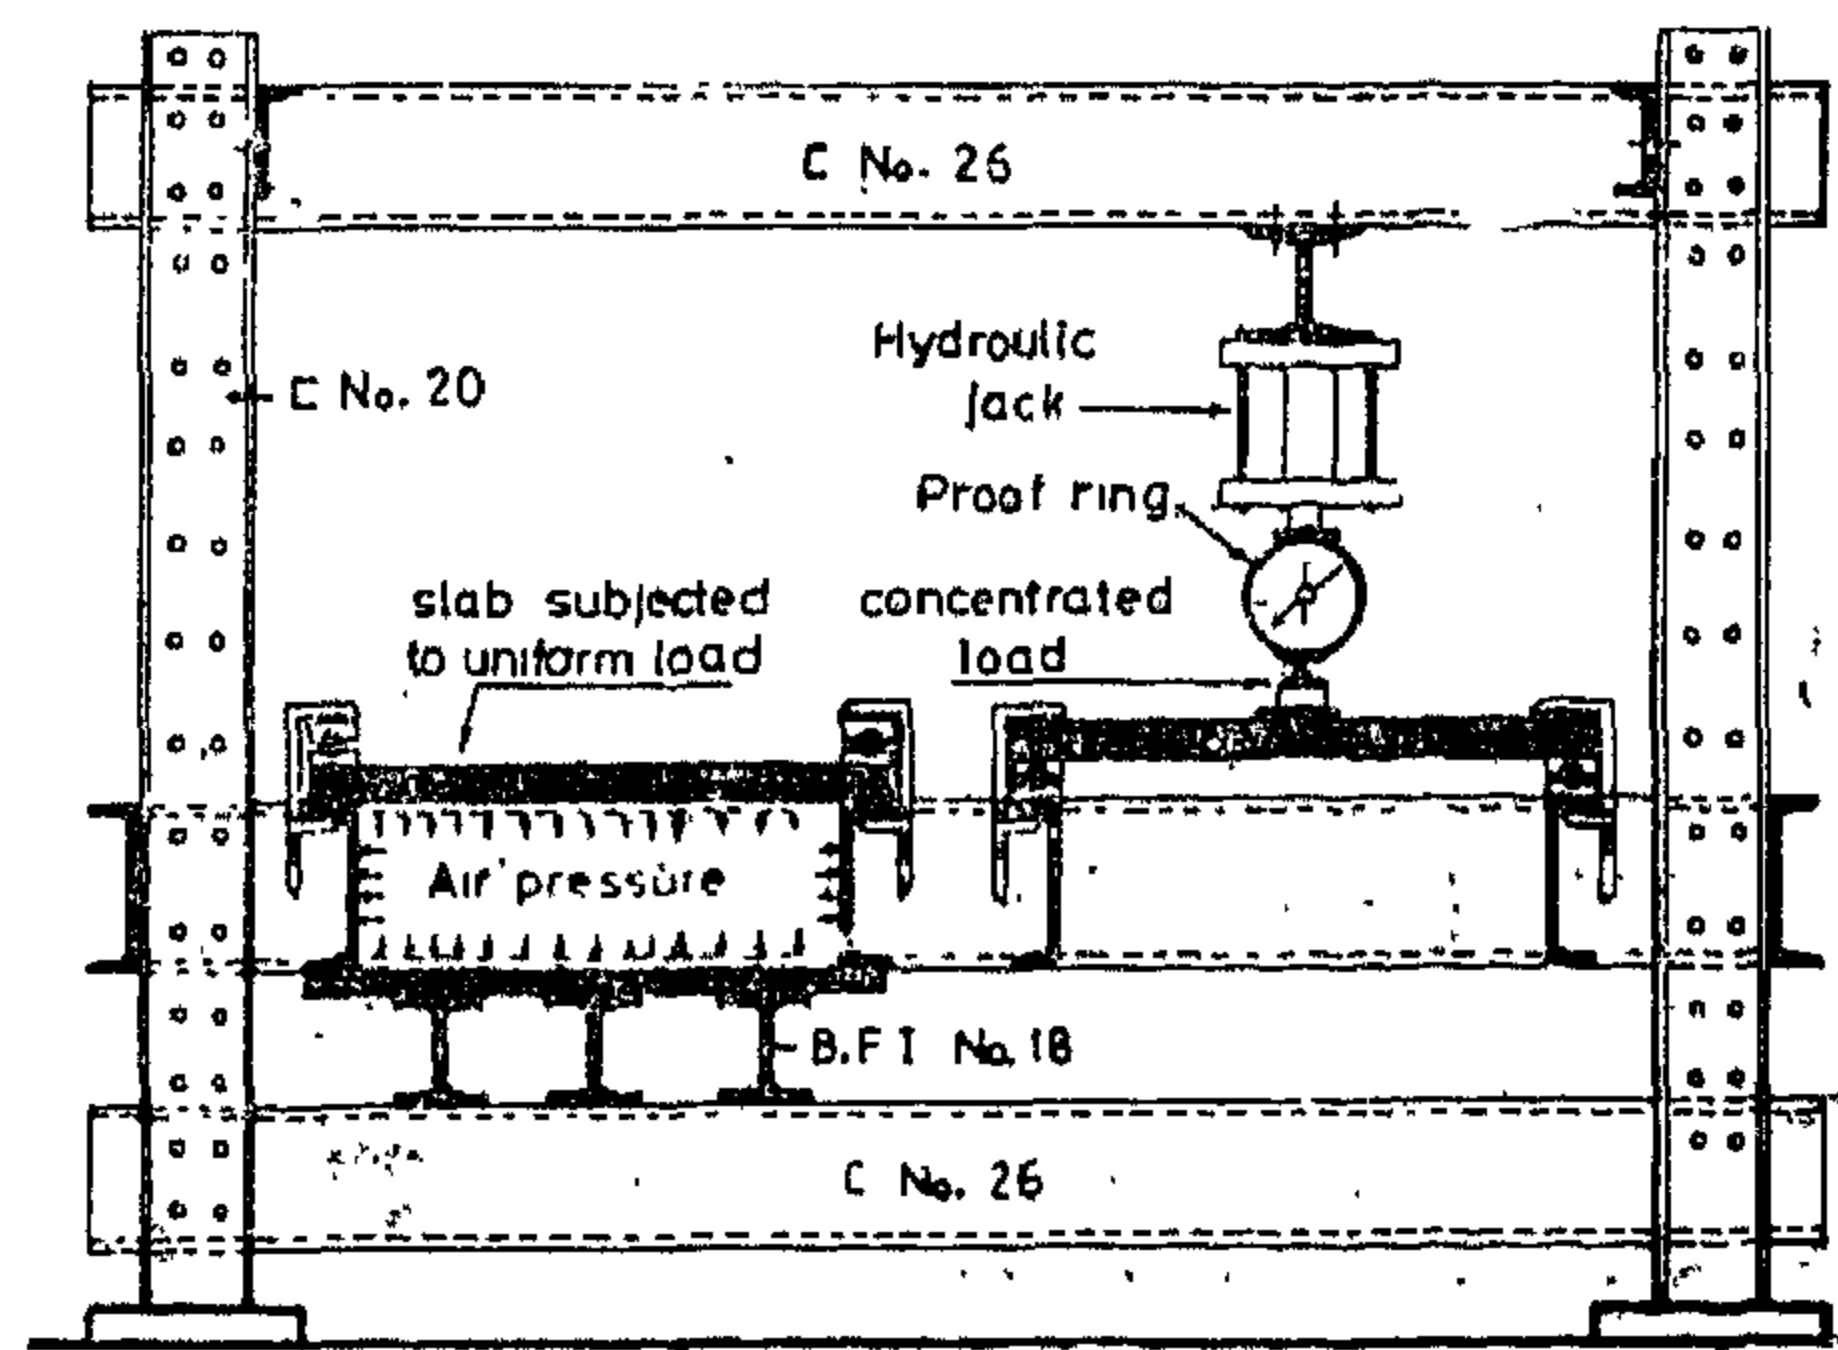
LOADING FRAME FOR TESTED SLABS
